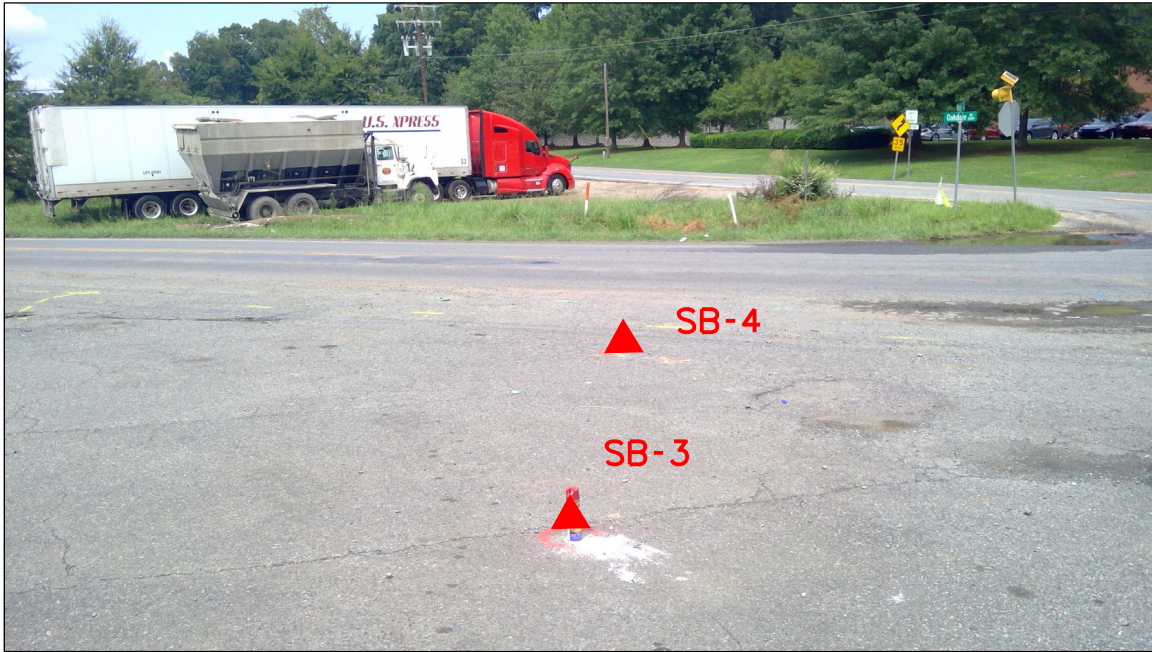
VIEW OF SOIL BORING LOOKING EAST
